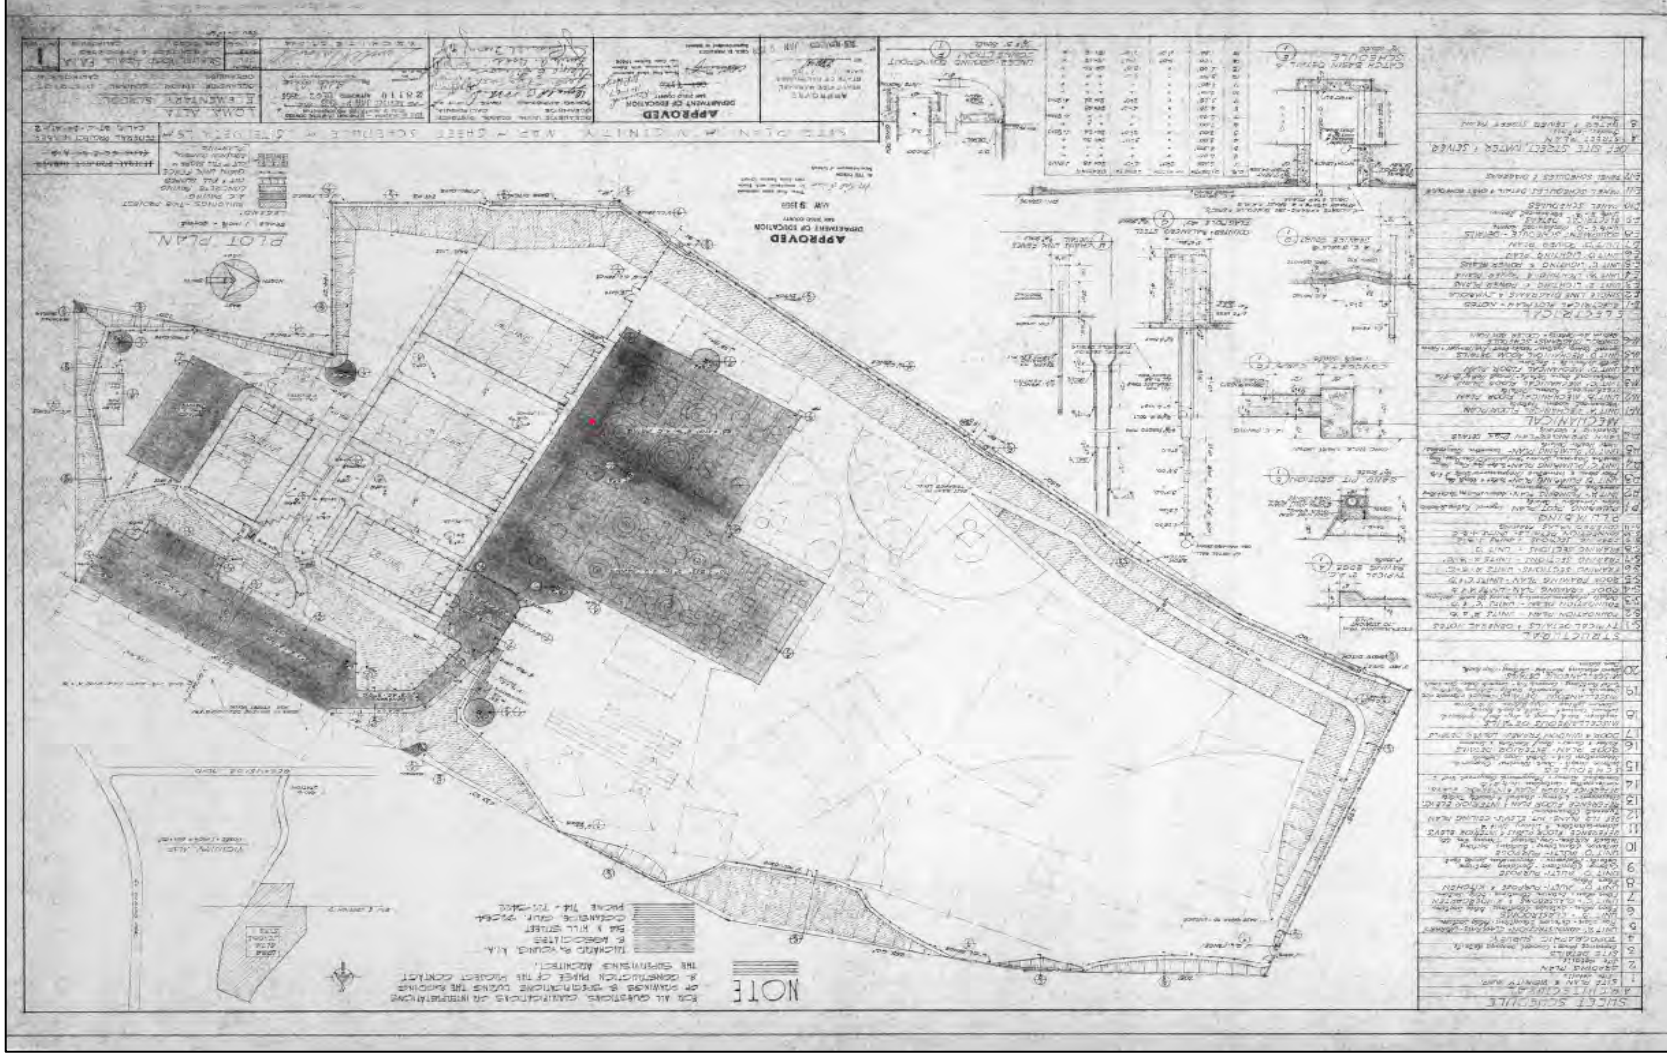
1966 Site Plan Drawing, Sheet 1. Source: San Diego History Center.
